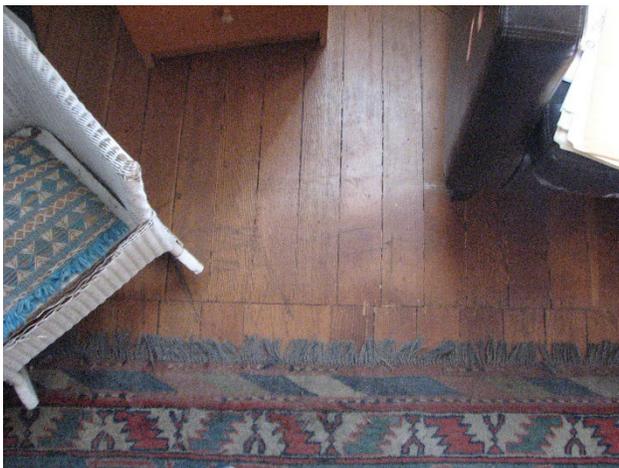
Living room floor, with line where the building was extended between 1902 and 1904, camera facing down
